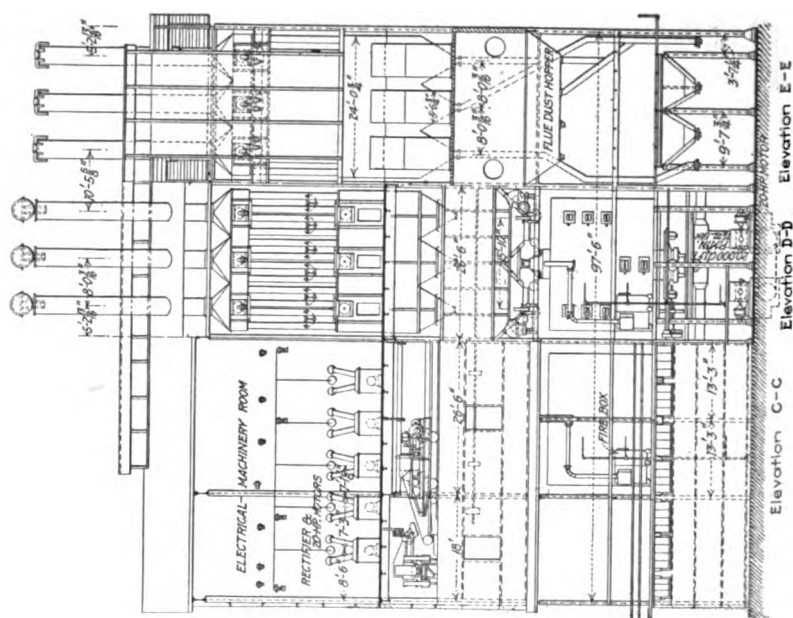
SIDE ELEVATION OF ROASTER OR DRYER PLANT,
